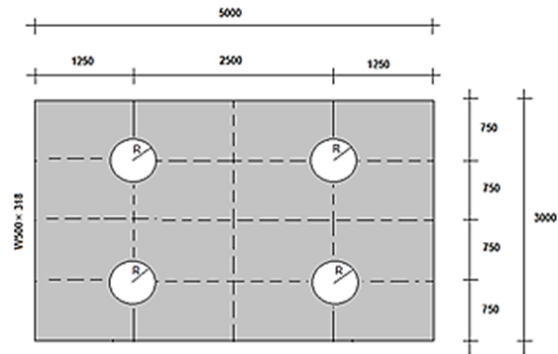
Schematic design of the inner plate in the steel wall shear wall
